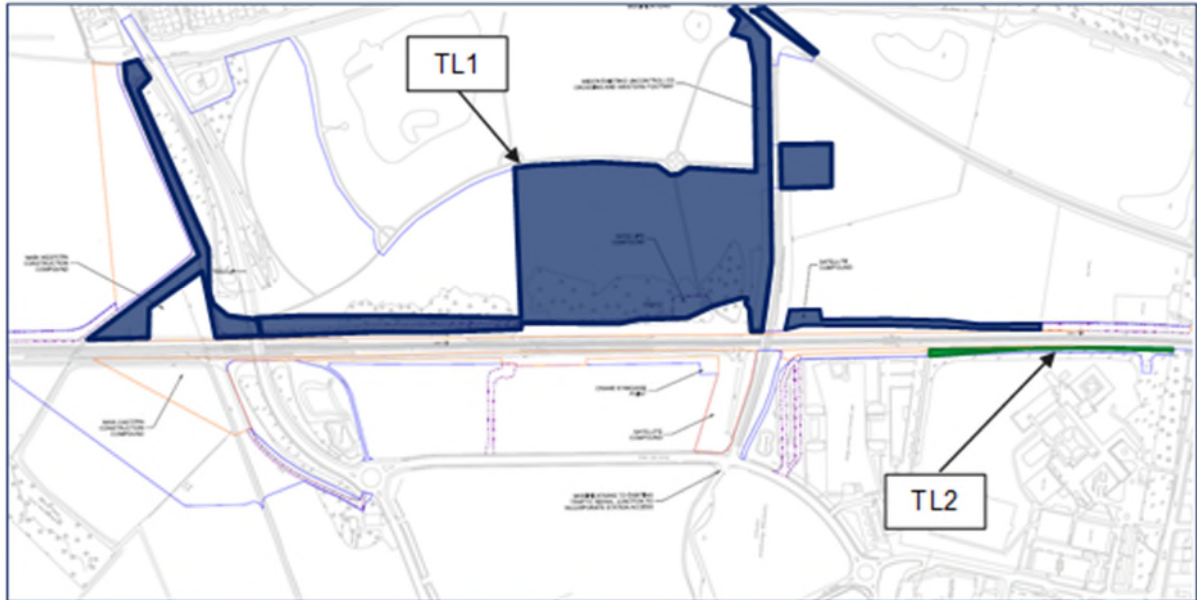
Temporary land take at Hobson's Park and Long Road Sixth Form College
